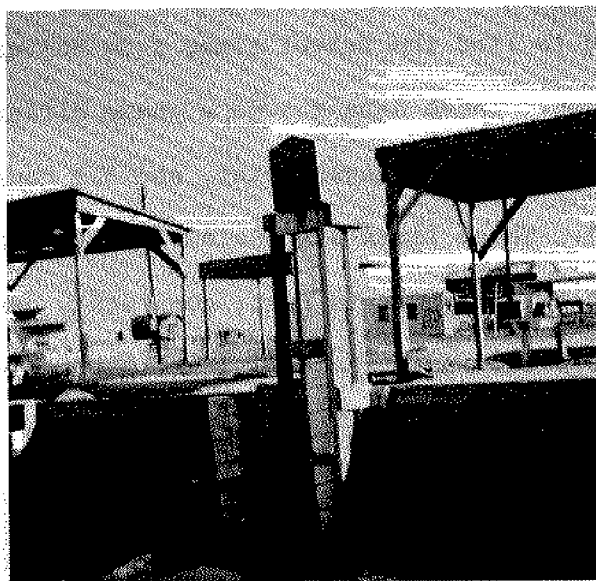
TIDE GAGE 1, TYPICAL INSTALLATION
